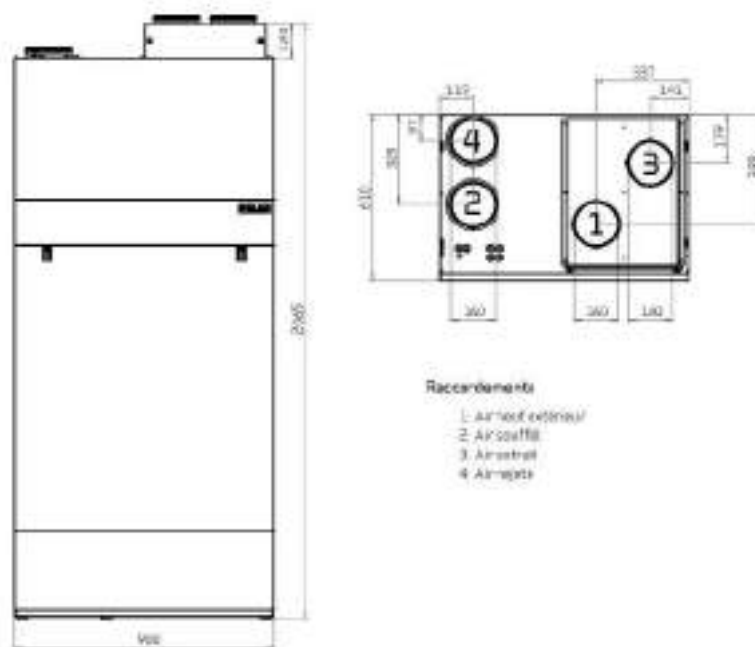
TECHNICAL DRAWING OF THE NILAN COMPACT P
